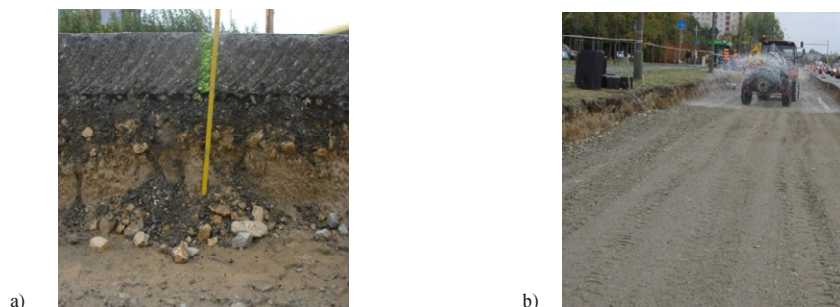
Construction site a) earth works, b) improved subgrade compaction
